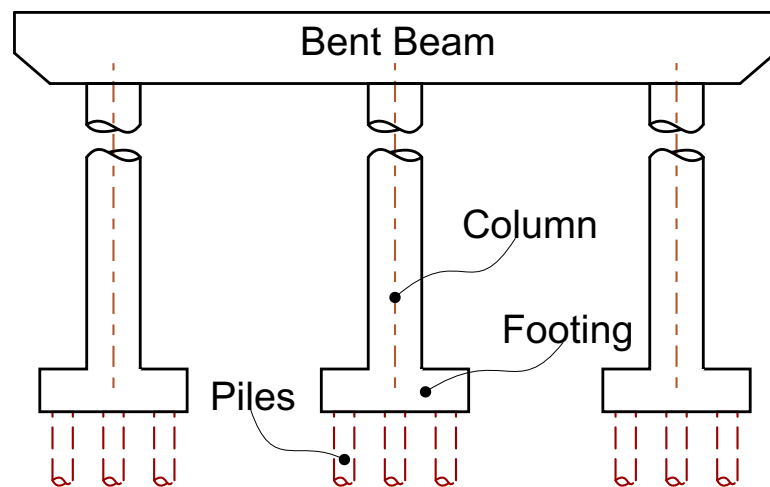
Typical Multi-Column Concrete Bridge Bent Configuration.
